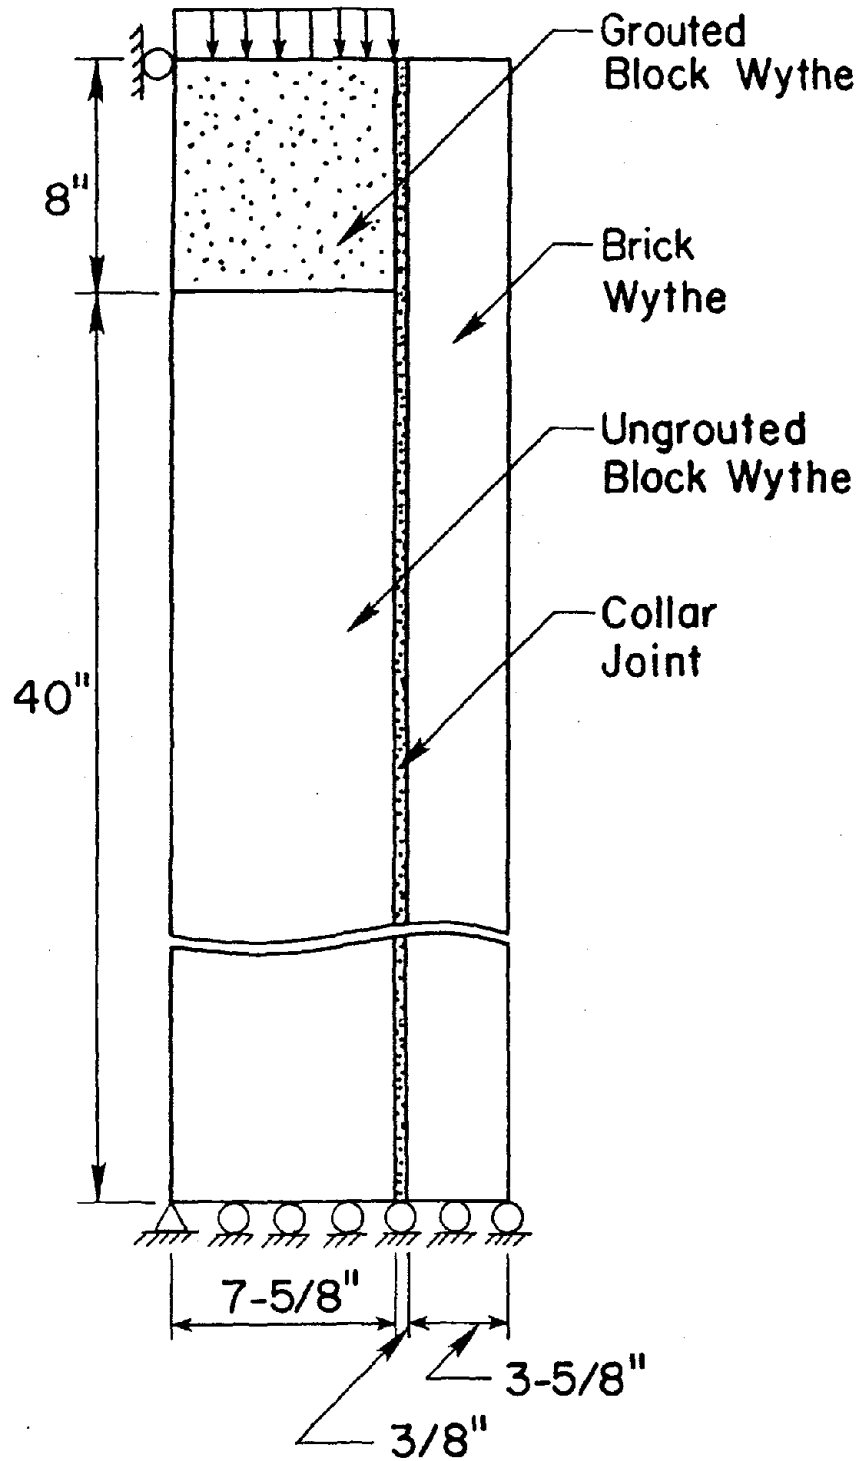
Composite Wall Specimen Tested at Clemson University
